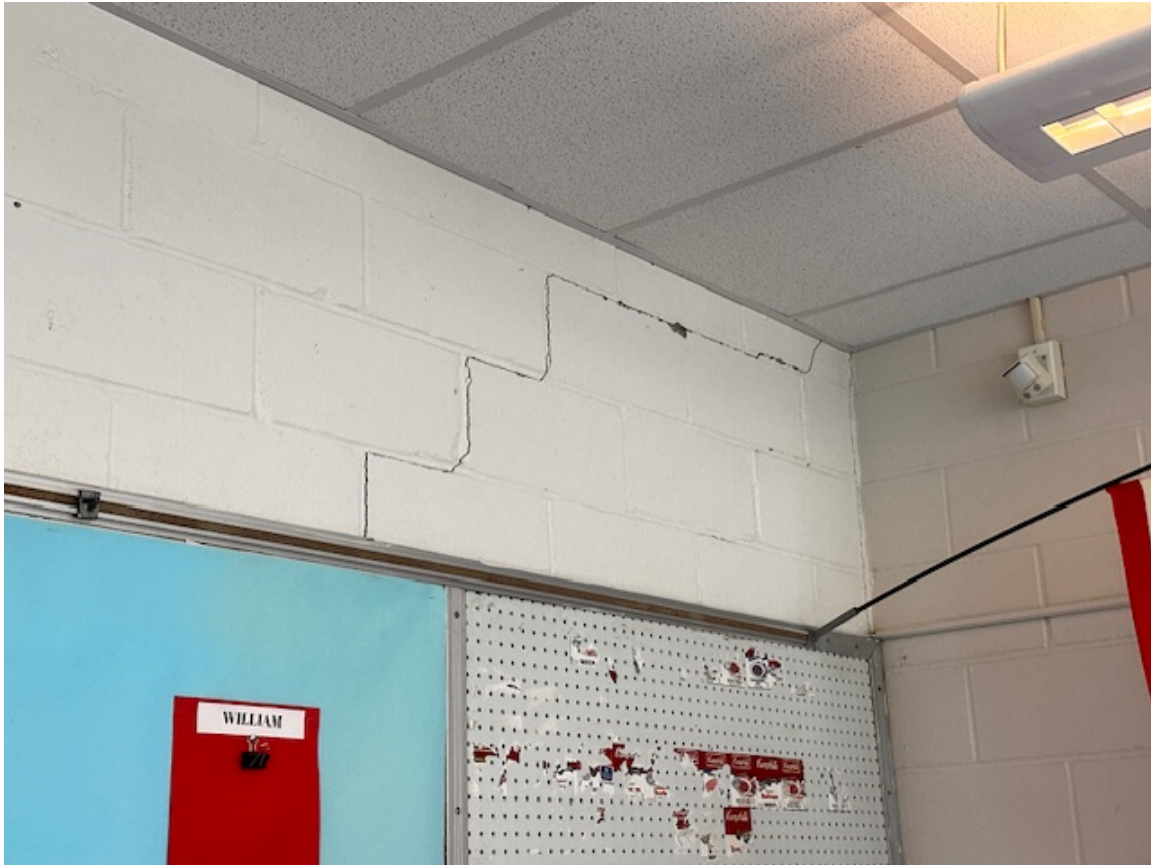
opposite side of the wall in Figure 2 showing that the stepped cracking carries through the wall. This is typical of differential settlement conditions in non-structural CMU walls.
